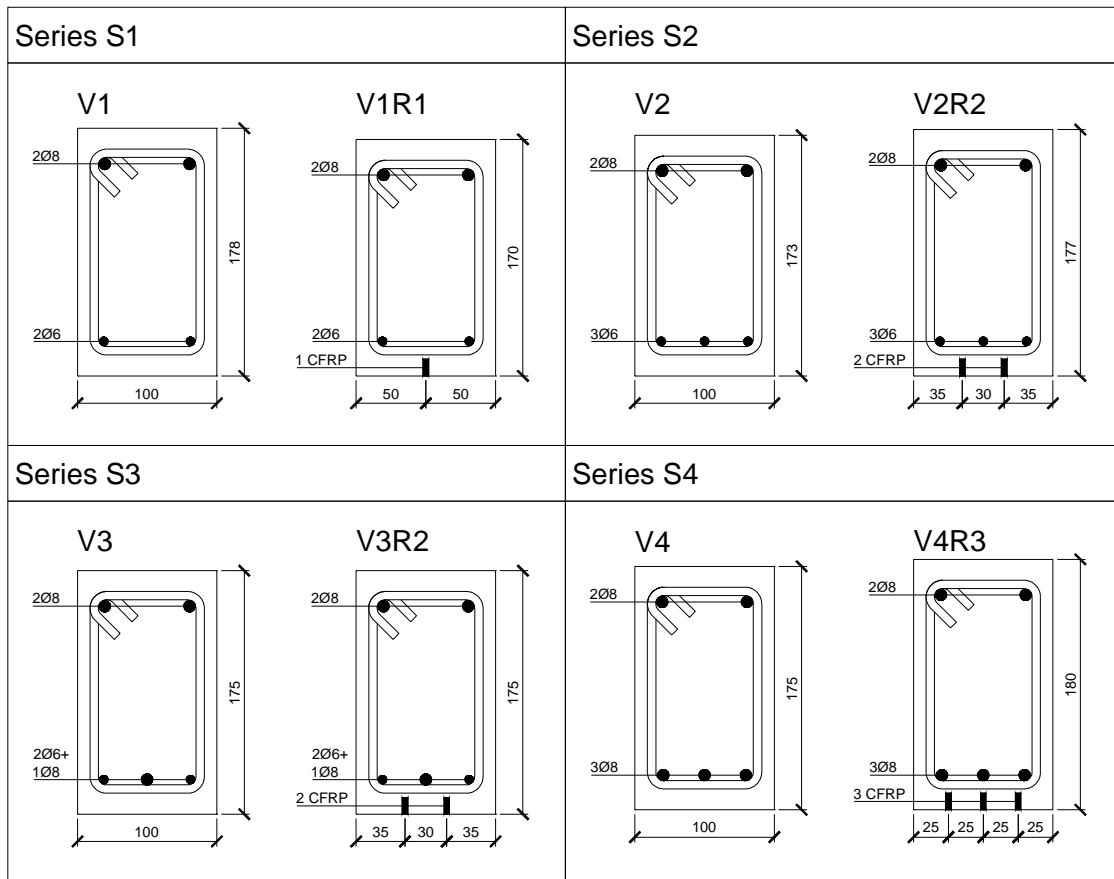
Cross section of the tested beams (Barros and Fortes 2002). Note: all dimensions are in millimeters.
